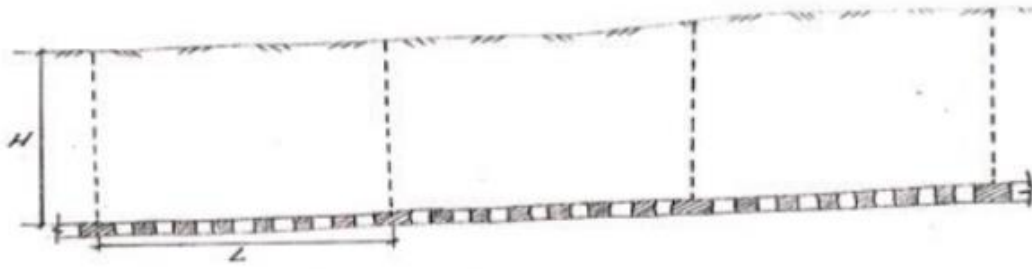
Types of roof failures in chambers at the Zhezkazgan deposit
